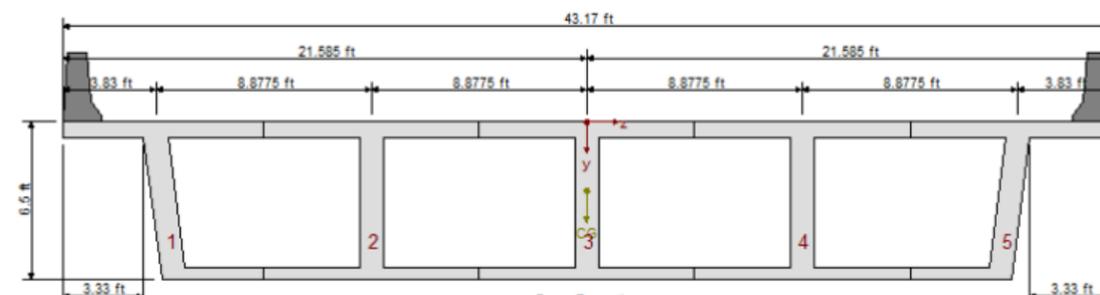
Bridges on Ramp NE over MC85 - Typical Section
